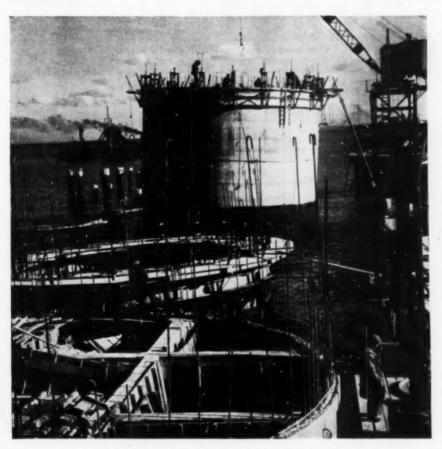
Foreground: Caisson on Platform (Jacks to the right). Middle: Caisson Affoat (lower part of wall under Construction). Background: Upper part under Construction.
